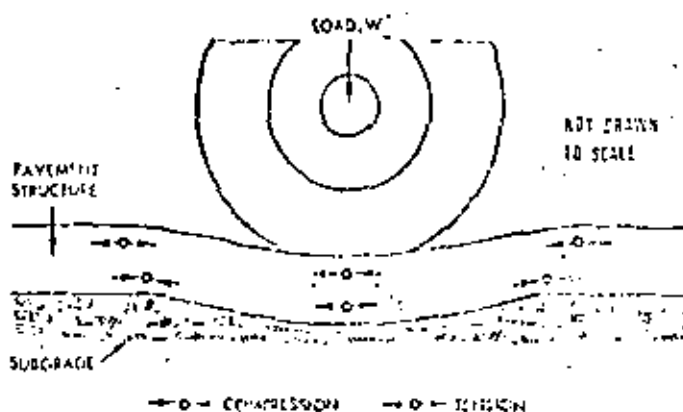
Pavement deflection results in tensile and compressive stresses in pavement structure
